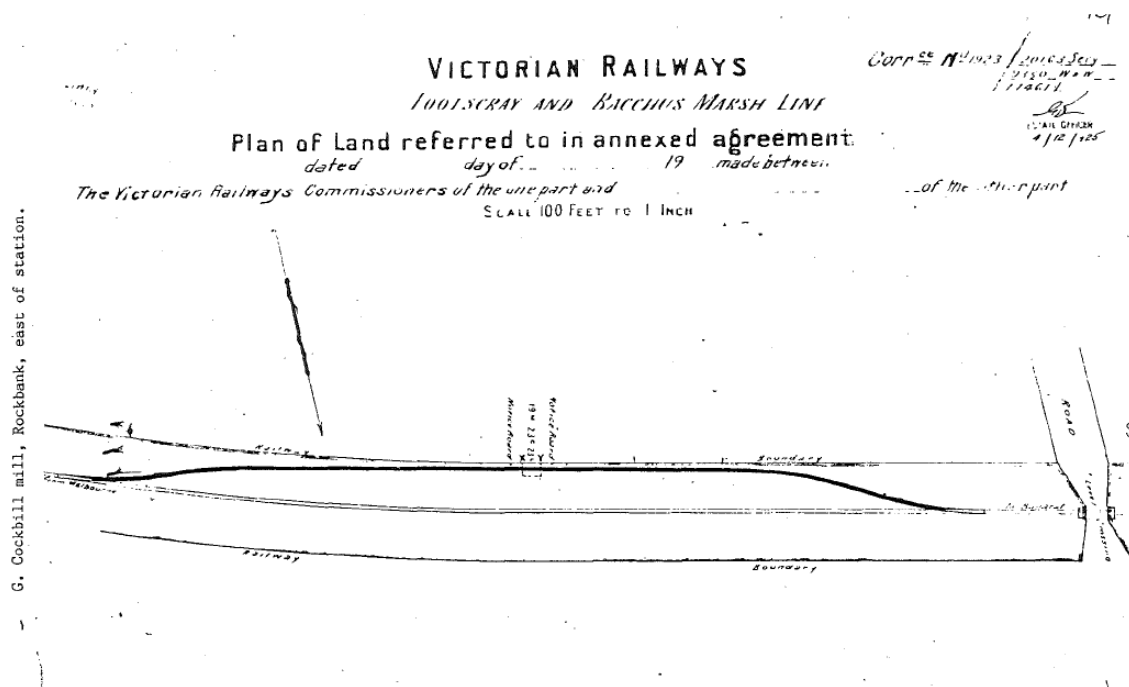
Siding plan at Cockbill's Rockbank Chaff Mill (VicTrack Sidings section)
